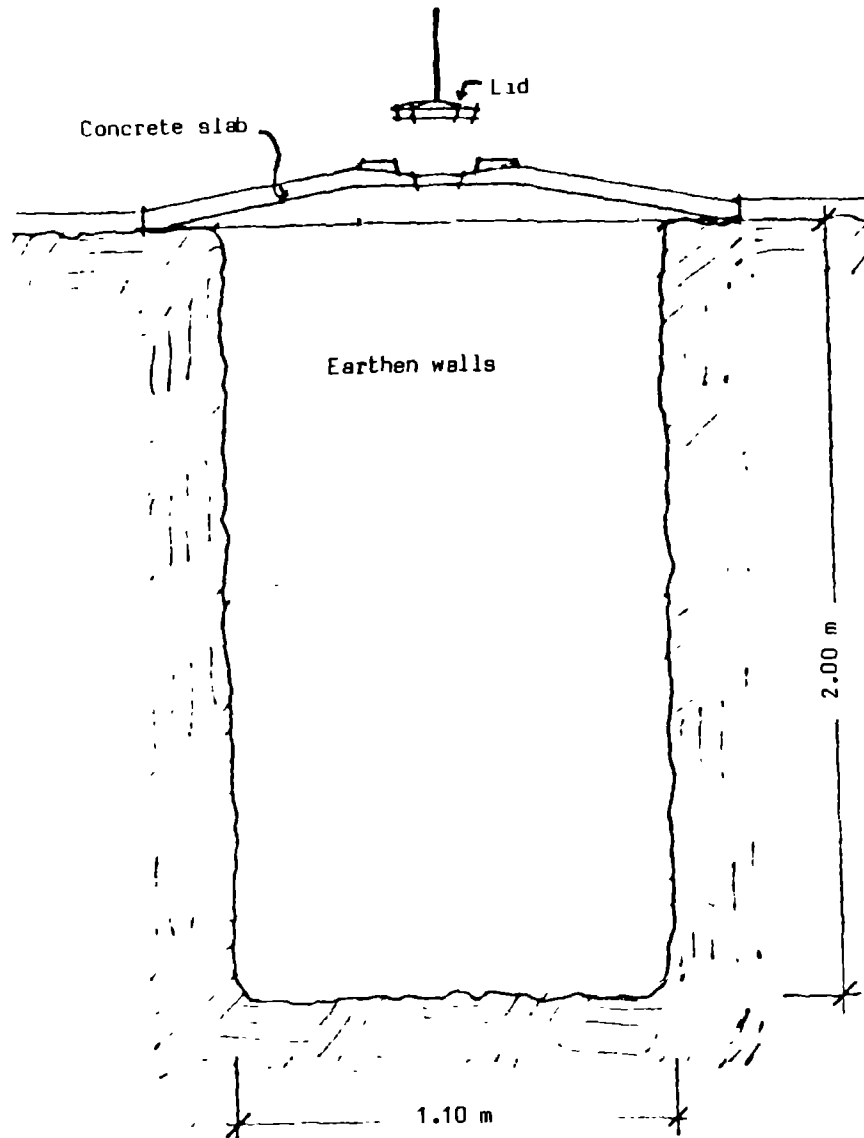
Latrine pit type S1. The unlined pit with a slab for stable soil.
